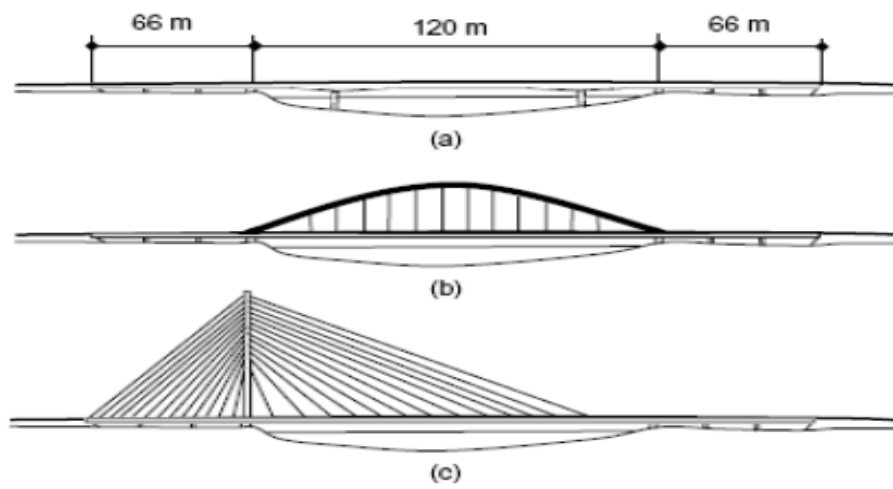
a) Cantilever bridge, b) arch bridge and c) cable stayed bridge (Collings, 2006)
